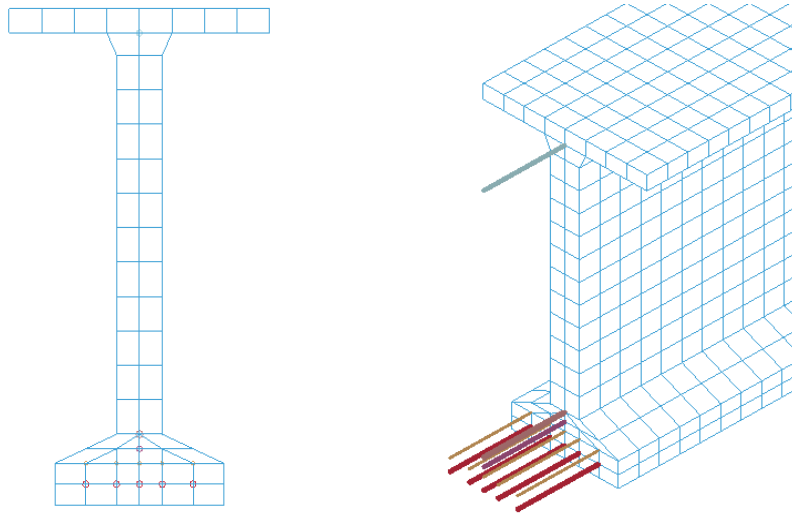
Zoom-In View of Strands at the Mid-Span of The Girder of Archetype 4 Bridge
